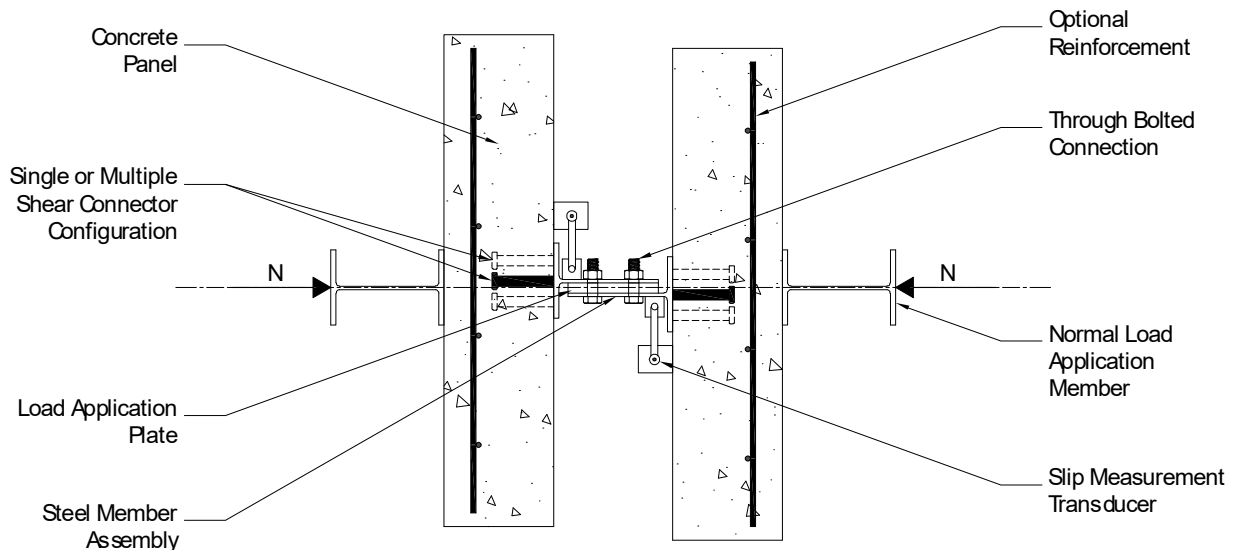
(b) Test Setup Top View (Section A-A)7. Test Specimen
